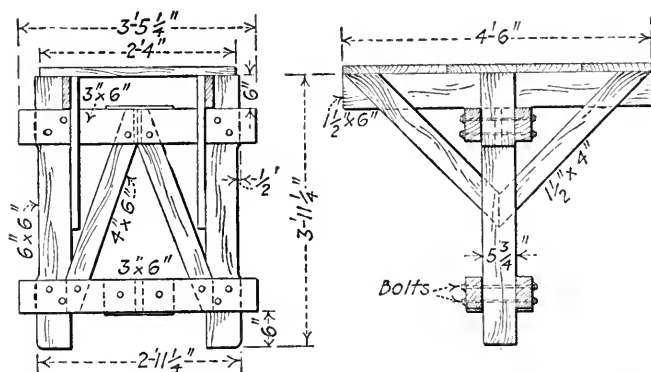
BUCKET CROSSHEAD WITH PLATFORM FOR LOWERING MEN.
